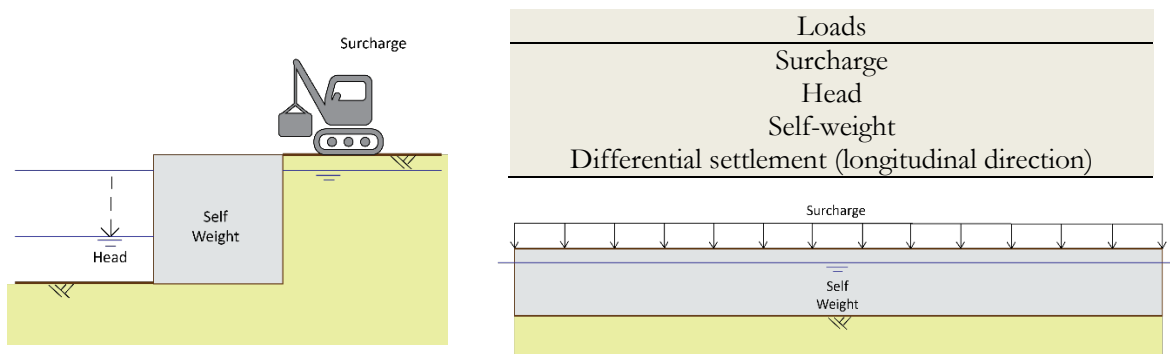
Loads on the GEOWALL in Cross-section and longitudinal direction
